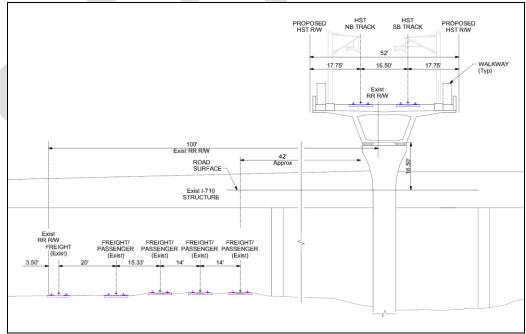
Typical Cross-Section – I-710 – Tall Aerial Option
